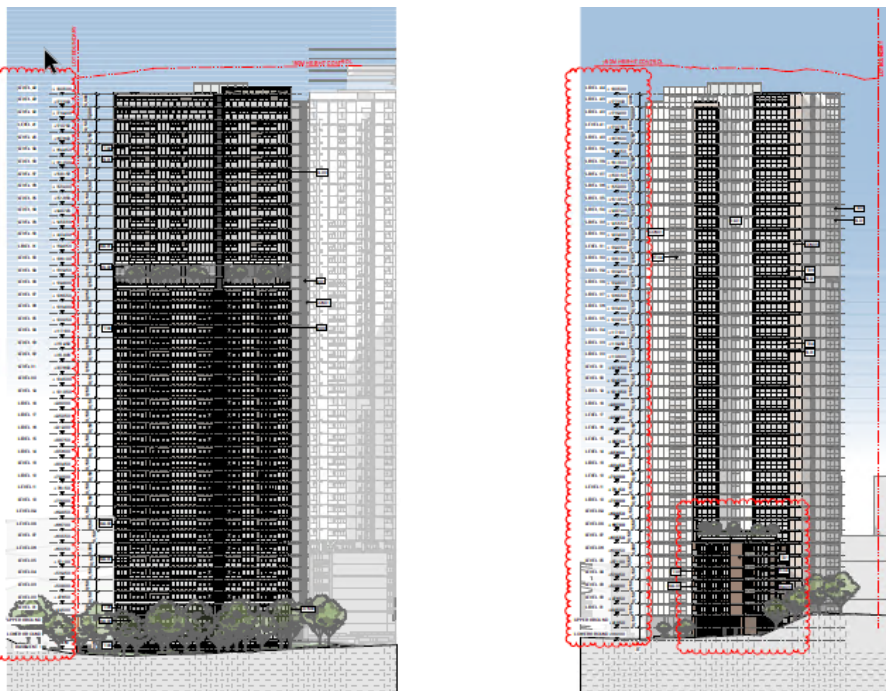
Proposed northern and southern elevations - Building A (new car park entry)
